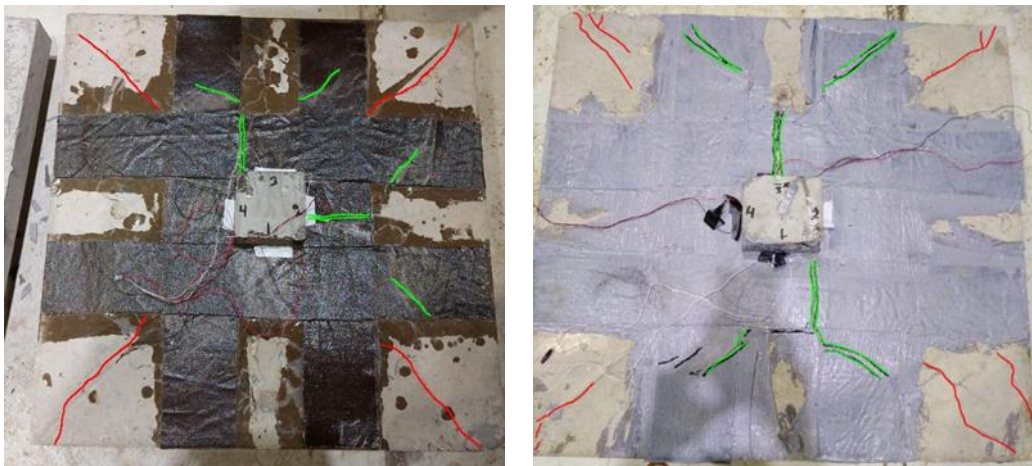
Typical crack pattern of specimens SA1-H10-Sikadur-300 and SA1-H10-Sikadur-330
